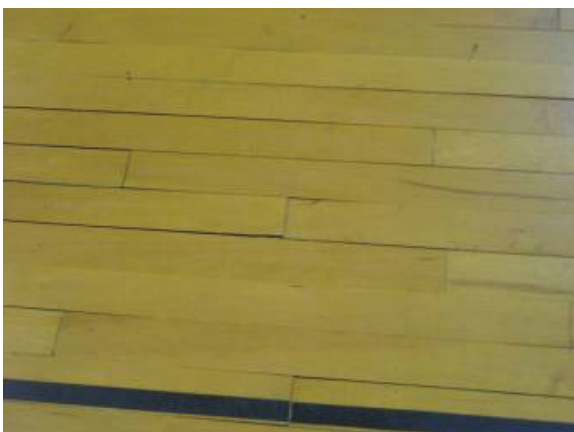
Hardwood gymnasium floor warped by moisture in the cavity below it. Water rises through the concrete sub-floor. The source of the moisture is rainwater that has not been drained away from the foundation of the building.
